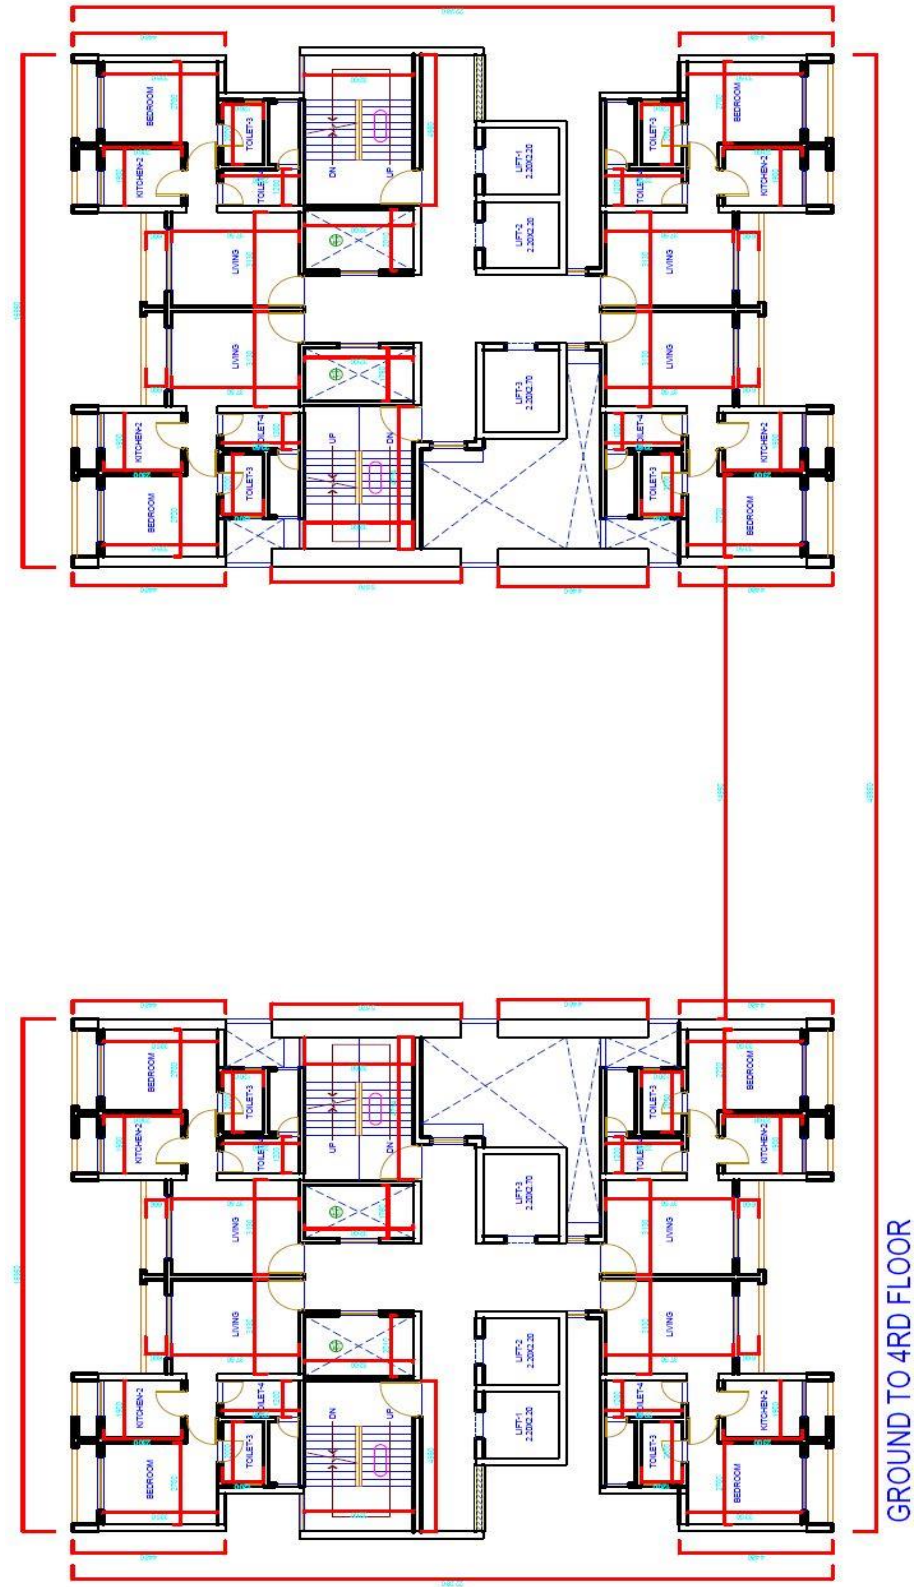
shows the plan of the building up to the 4<sup>th</sup> floor without transfer slab building
